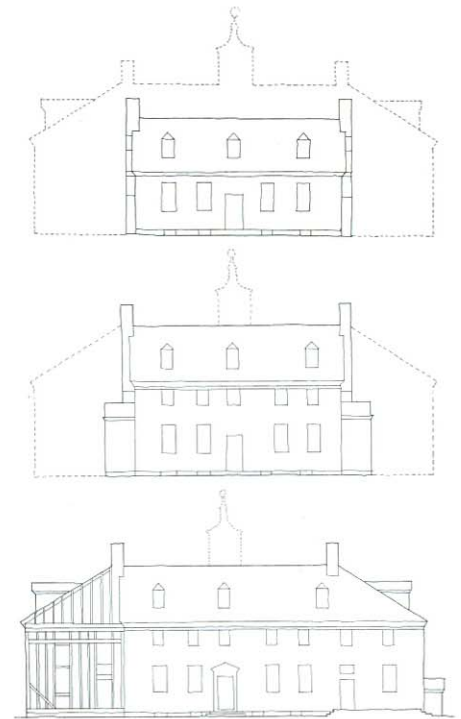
Series of west elevations, showing the evolution of the mansion from 1743-52 (Lawrence Washington), to the initial work by George Washington in 1757-58, and the enlargement of the house in 1775. These elevations, together with evolutionary floor plans, summarize the archival research and physical investigations carried out during the preparation of the historic structure report.
